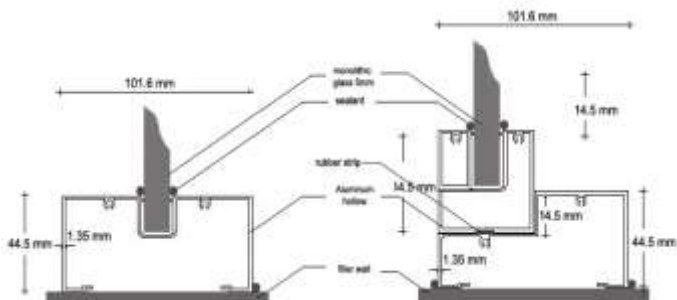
Detailed section of the Aluminum frame of fixed (left) and open (right).
